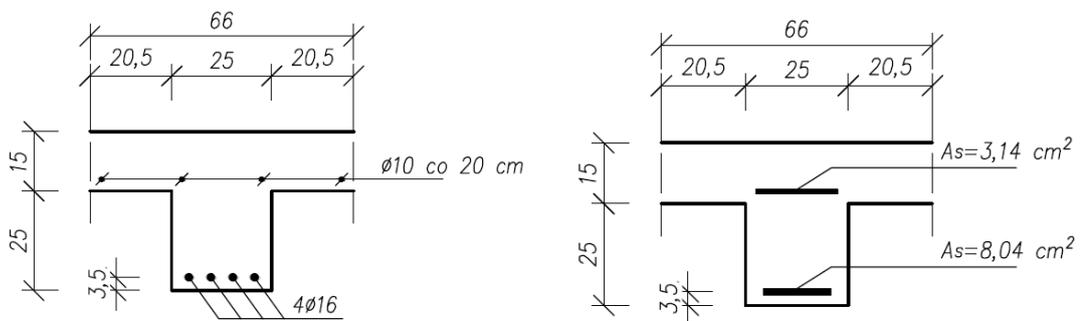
Steel-bar reinforcement details of repeatable plate element (left) and substitutional cross-section (right).
